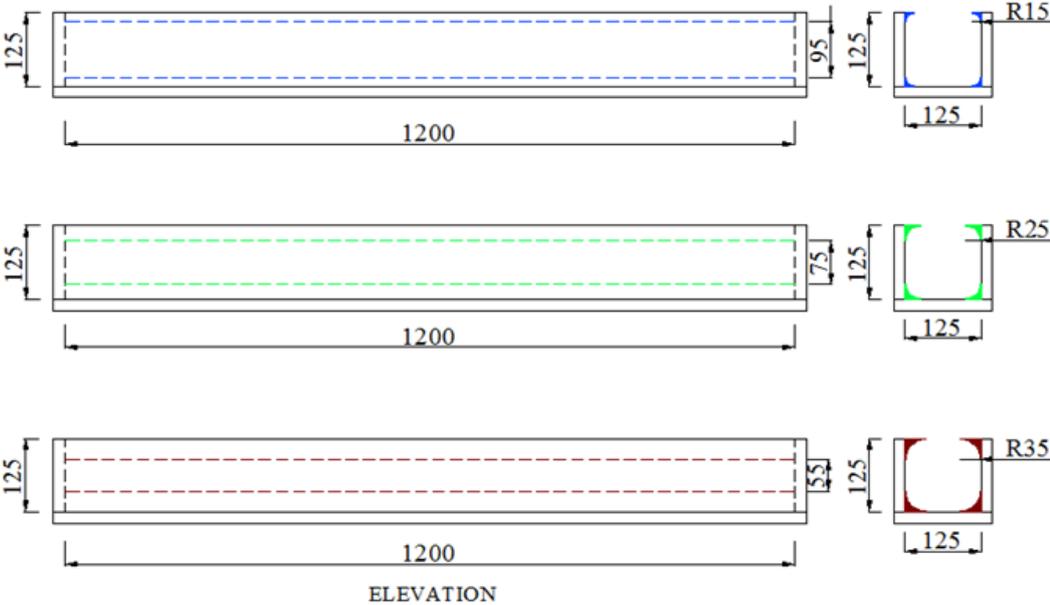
Schematic view of formwork for columns with corner radius 15mm, 25mm and 35mm
